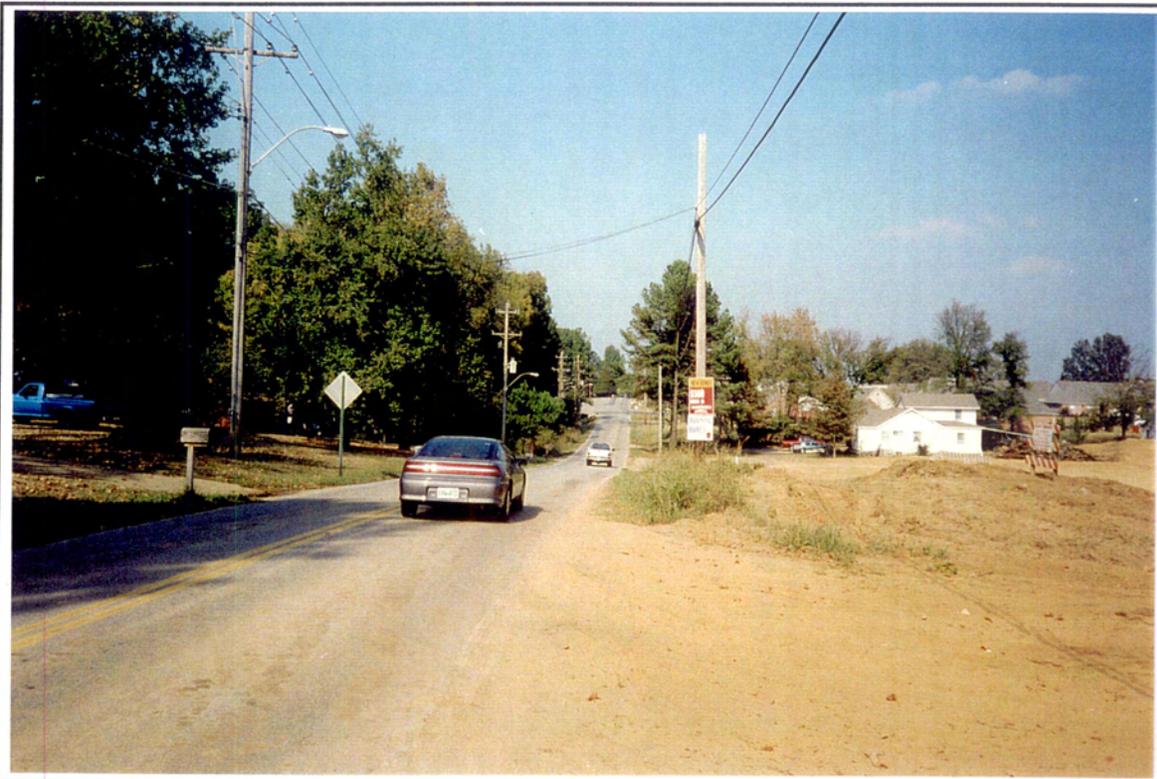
View to the north on Whitten Road, just north of the Whitten Road and Mullins Station Road Intersection.
